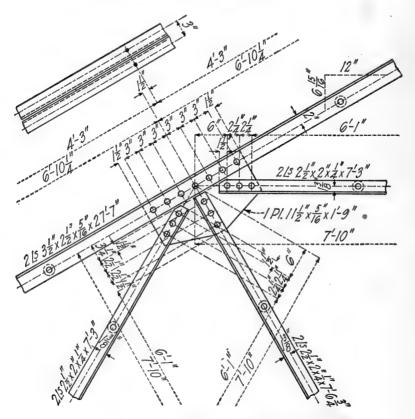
TRUSS JOINT, COMPLETELY DETAILED.
